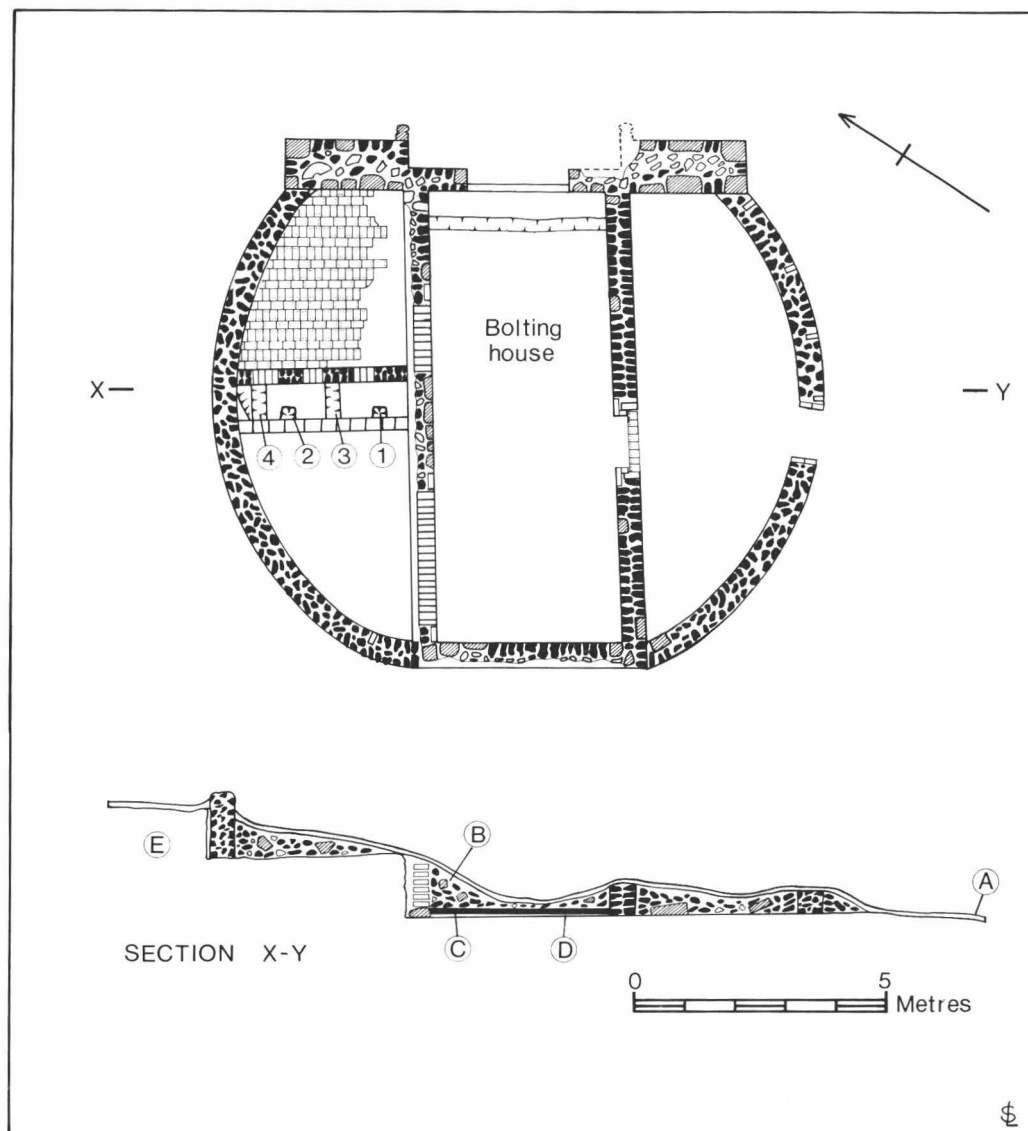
Plan and section of the Boltinghouse and Horizontal mill, Pashley Down (site 5). The plan: The rectangular boltinghouse and facade are constructed of brick, flint (black) and sandstone (shaded), with evidence of a lean-to with a roof-tiled floor to the north. The conversion to a horizontal mill is represented by the addition of the arcs, built of field flint. The section: shows how the building was terraced into the hillside. Layer A. Turf and topsoil, B. Demolition layer, C. Loam with pottery, bone fragments and glass, D. Rammed flint and mortar floor, no finds, E. Natural chalk.
